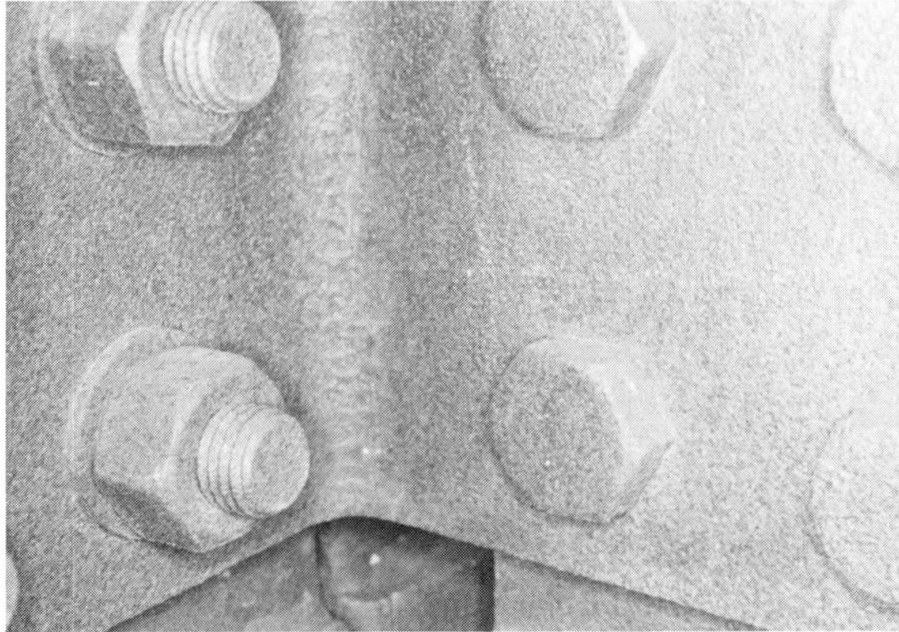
Fatigue Crack in Longitudinal Girder-Beam (Bent) Angle Connection
